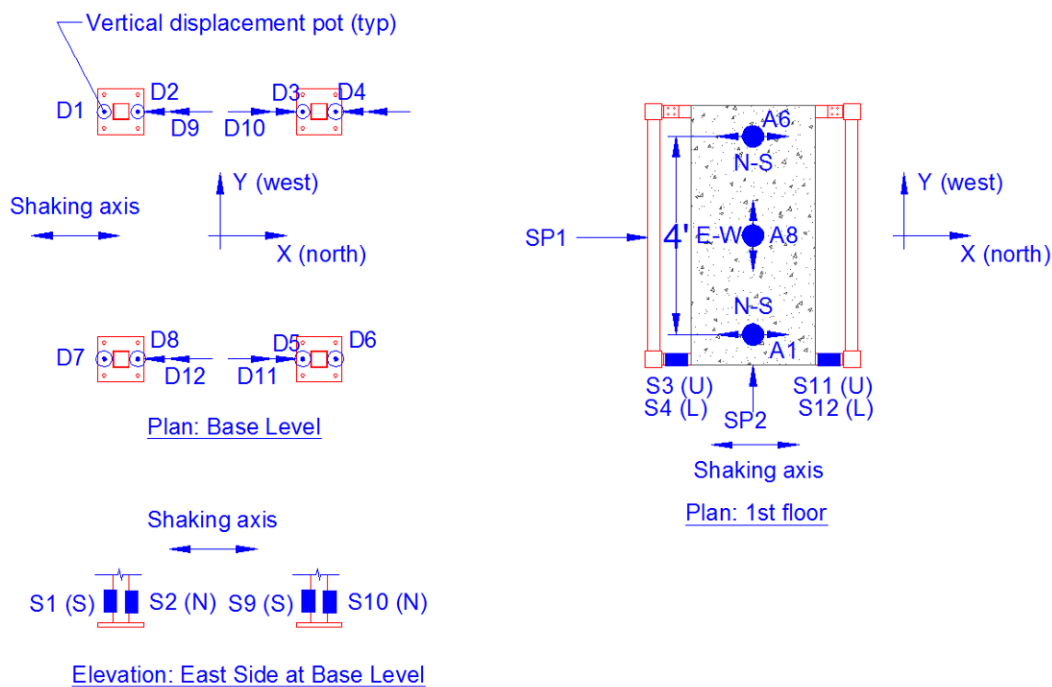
Instrument names for base connections, column fuses, and first floor
